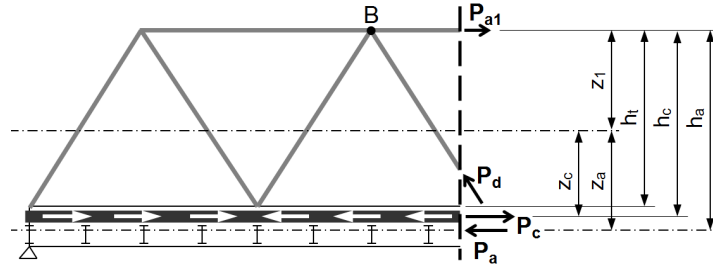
Analysis of forces in truss girder members due to shrinkage of slab concrete
